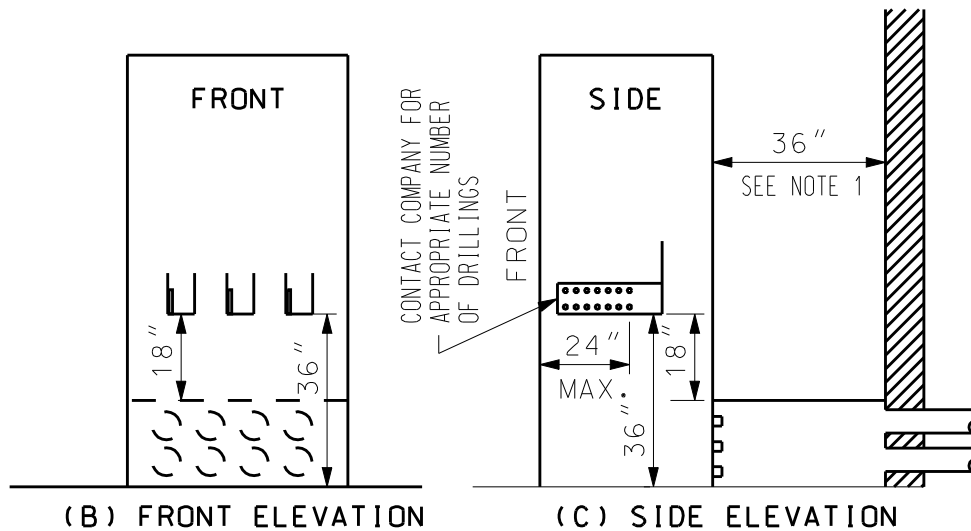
CONDUIT AND CABLE ENTERING BOTTOM REAR OF SWITCHBOARD.
